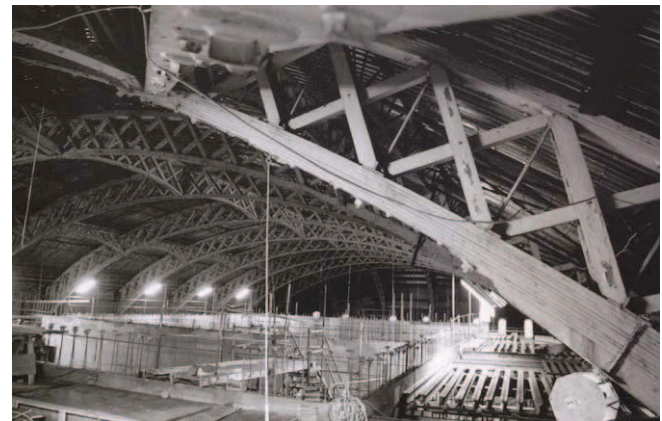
Historically significant parallel-chord wooden barrel truss close-up
